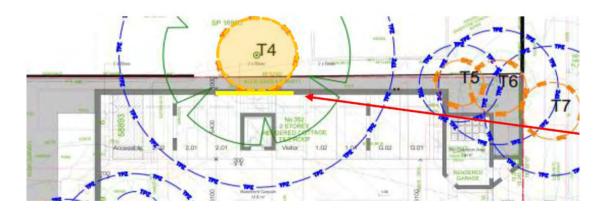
Structural Root Zone for Tree T4 and Proposed basement car park
